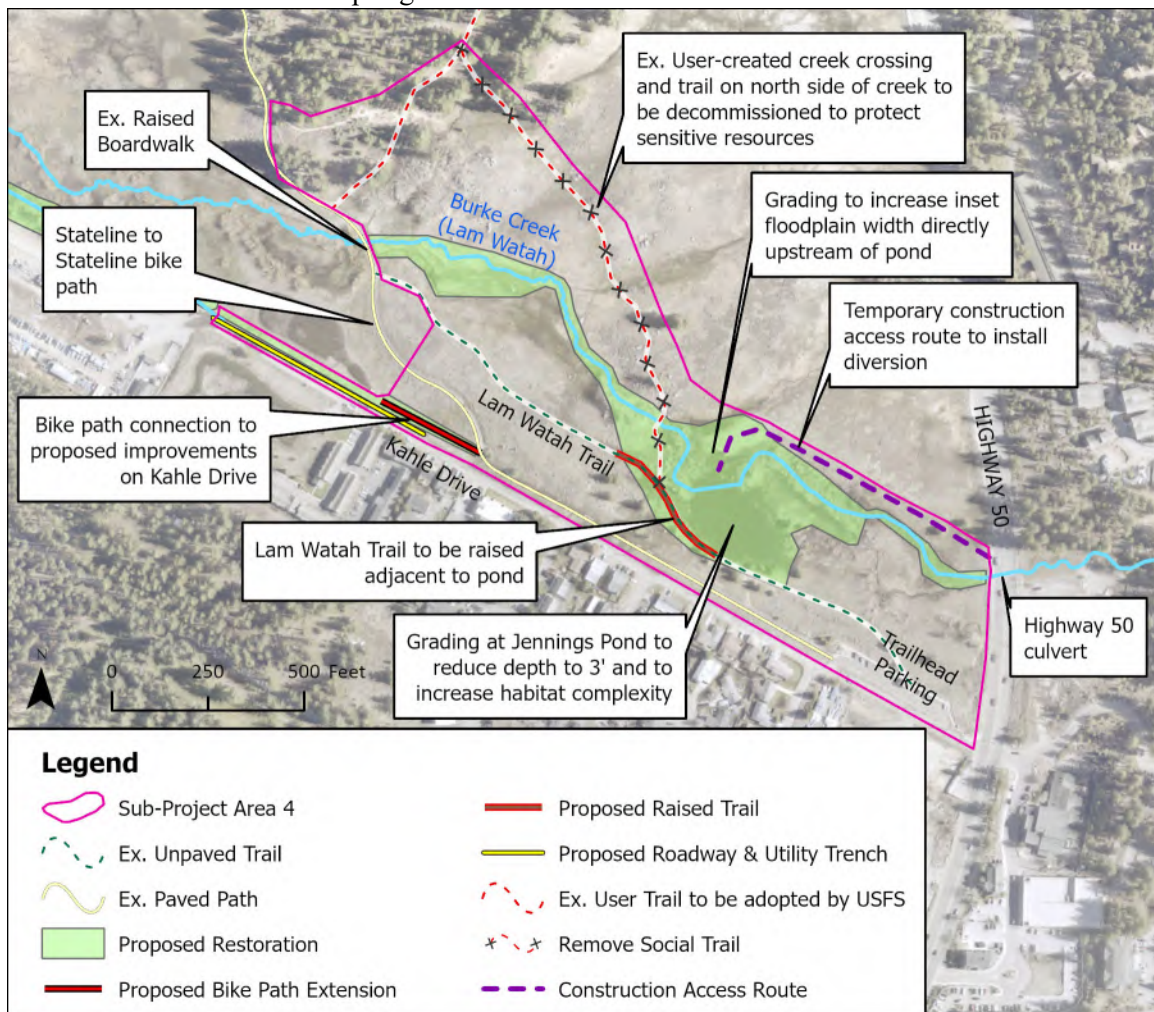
Sub-Project Area 4: Jennings Pond restoration and recreation improvements
